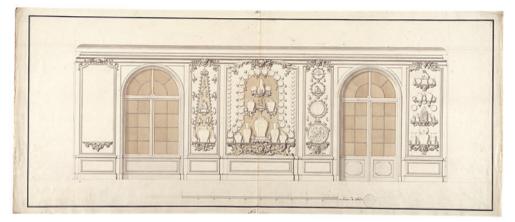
Zacharias Longuelune, Detail of a drawing for a wall arrangement in the Japanisches Palais, Dresden, c. 1735
